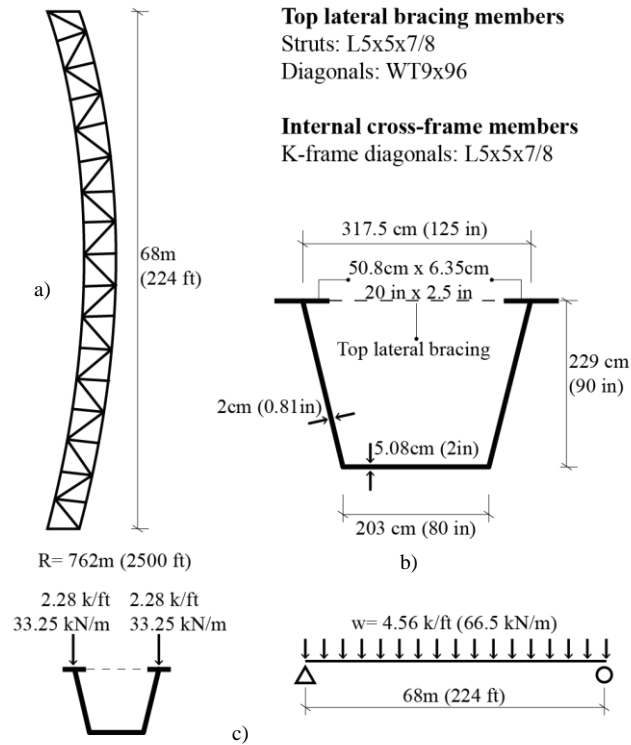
Tub Girder Example Features: a) Plan View. b) Cross-Sectional Properties, c) Applied Load
